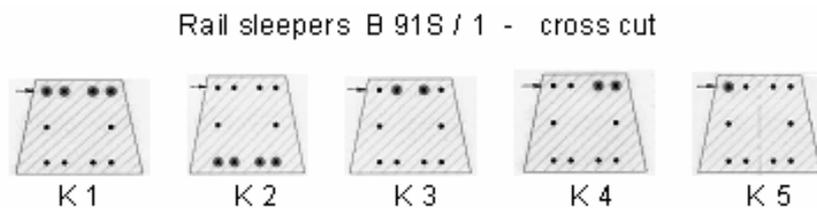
Corroded reinforcement bar numbers and layout.
